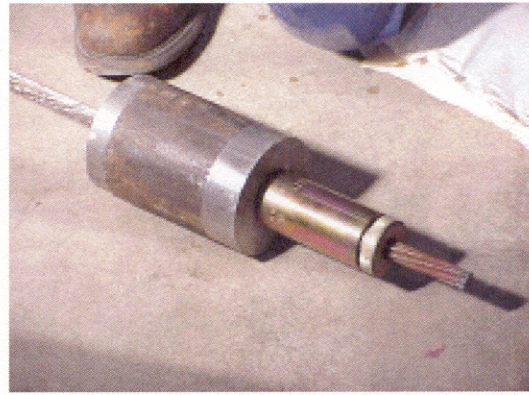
Chucked Specimen With Blocking Sleeve Installed
